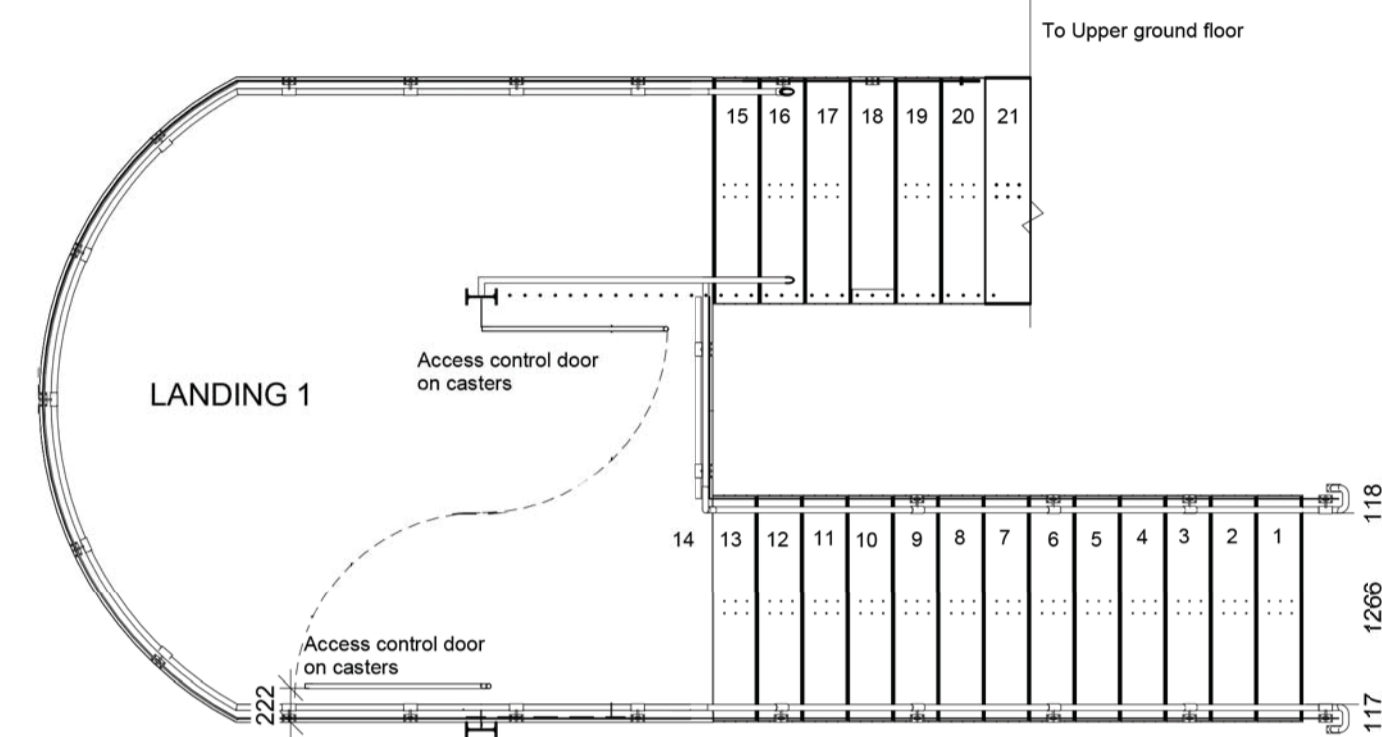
LANDING 1 PLAN SCALE 1:50
